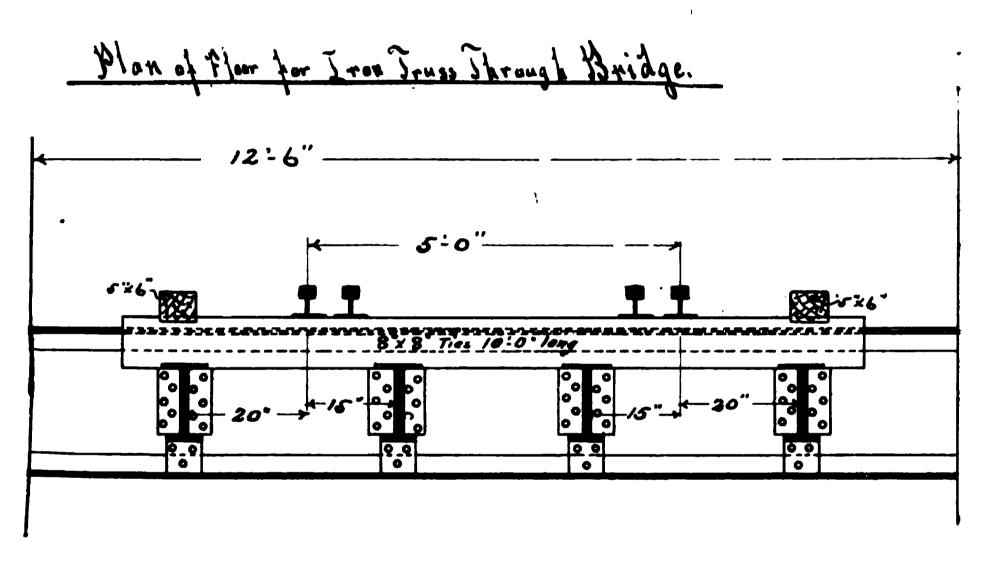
Plan of Floor for an Iron Truss Through Bridge, recommended by Mr. John Foreman (Philadelphia & Reading R. R.).
